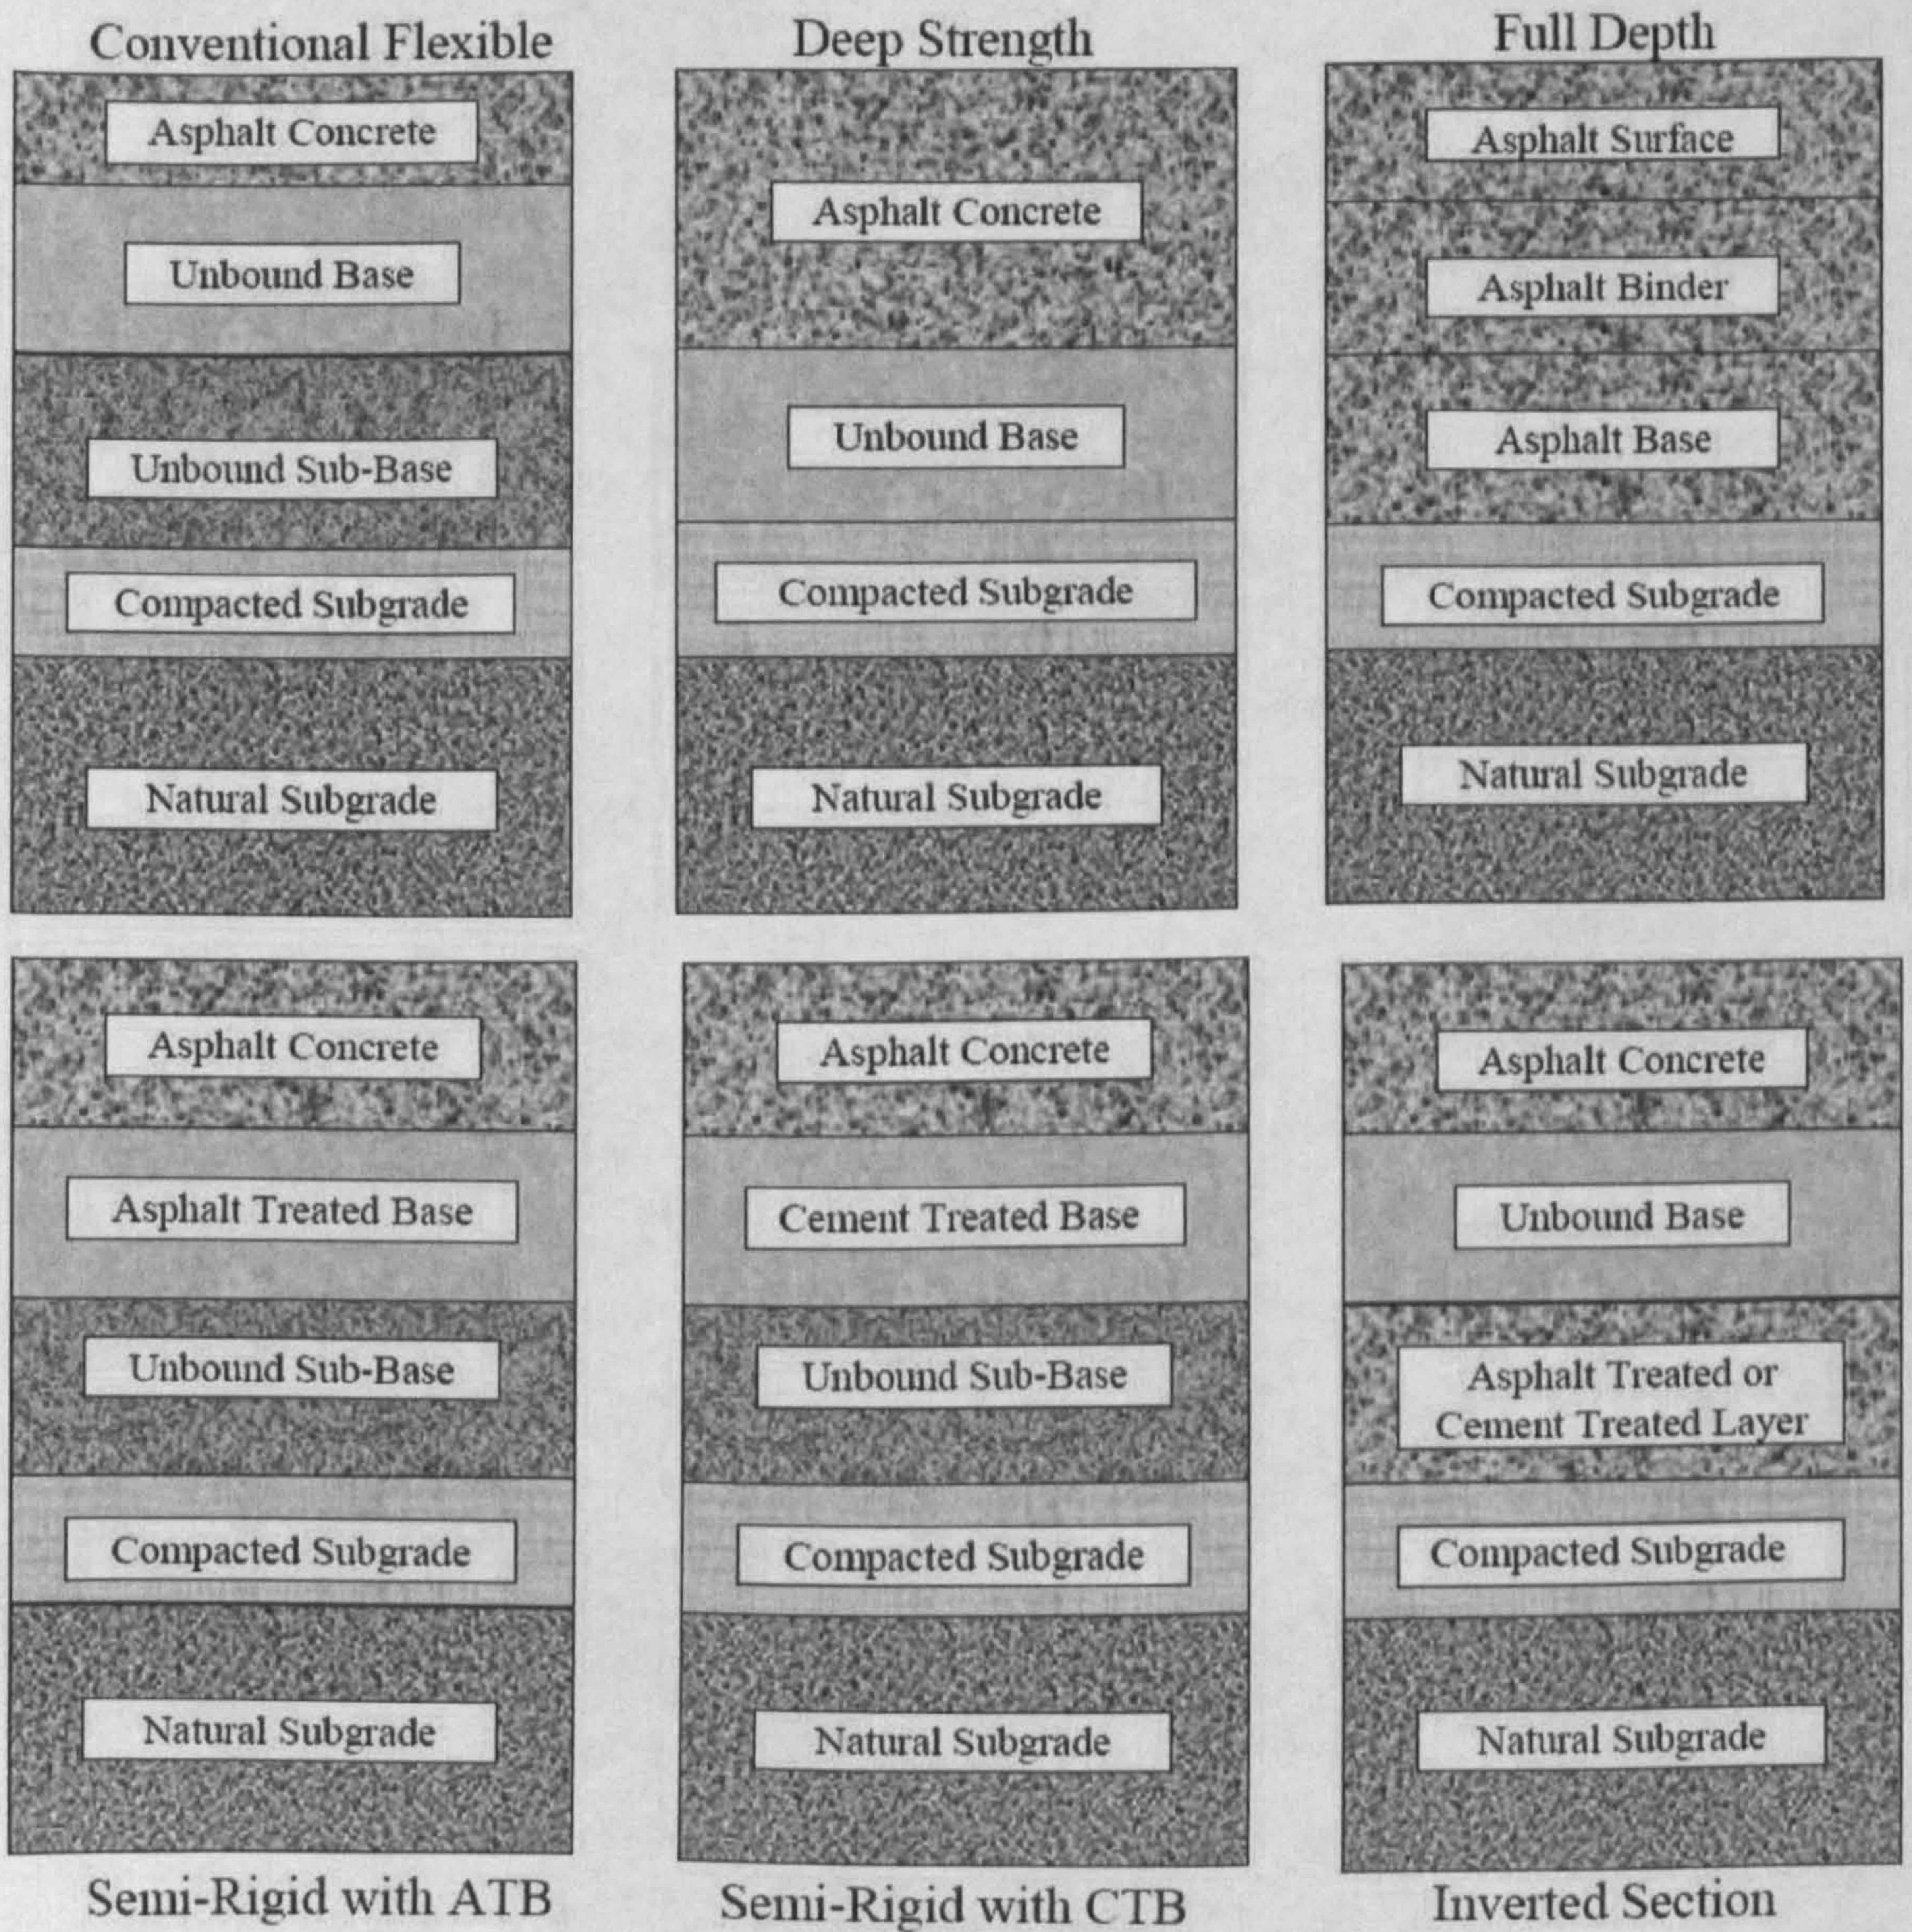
Illustration of possible asphalt pavement layered systems (From NCHRP, 2004).
